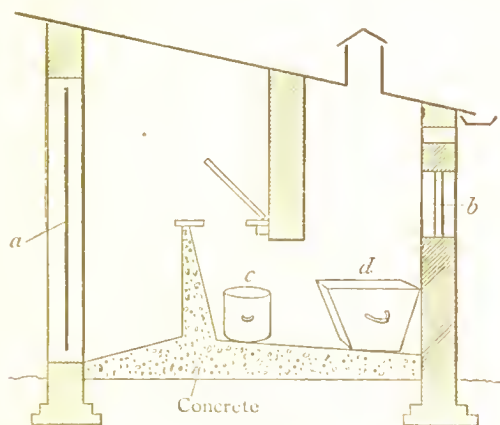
a*, Privy door; *b*, dry refuse door; *c*, pail for excreta; *d*, dust bin.
